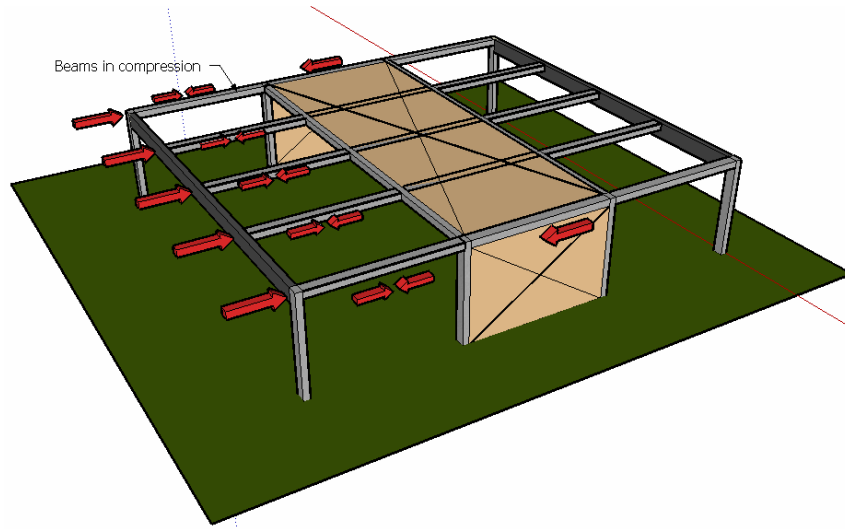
Lateral forces are transferred through roof members to roof diaphragm to side shear walls/bracings
